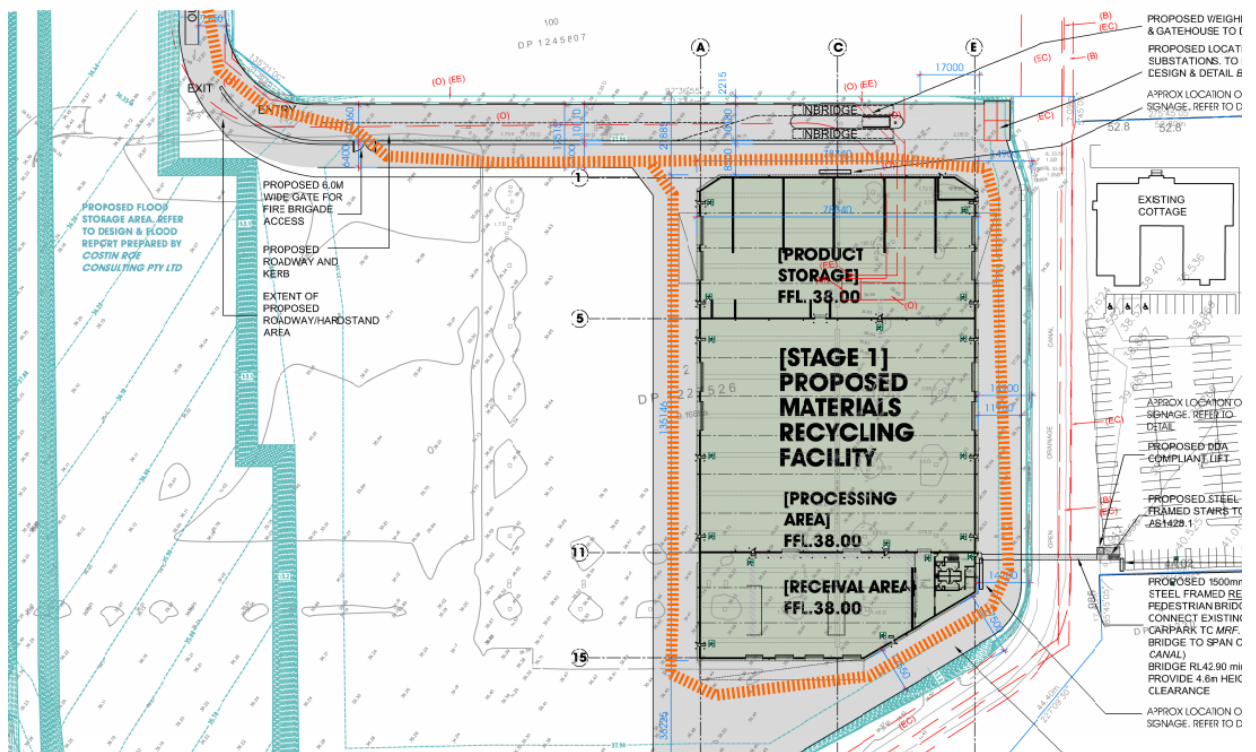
Site Plan with FRNSW Access Road Mark-up's (Source: Envision Group Pty Ltd)
